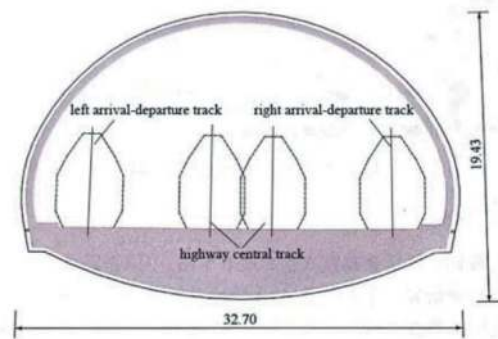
Schematic cross-section of the super-long tunnel in Badaling underground station.
